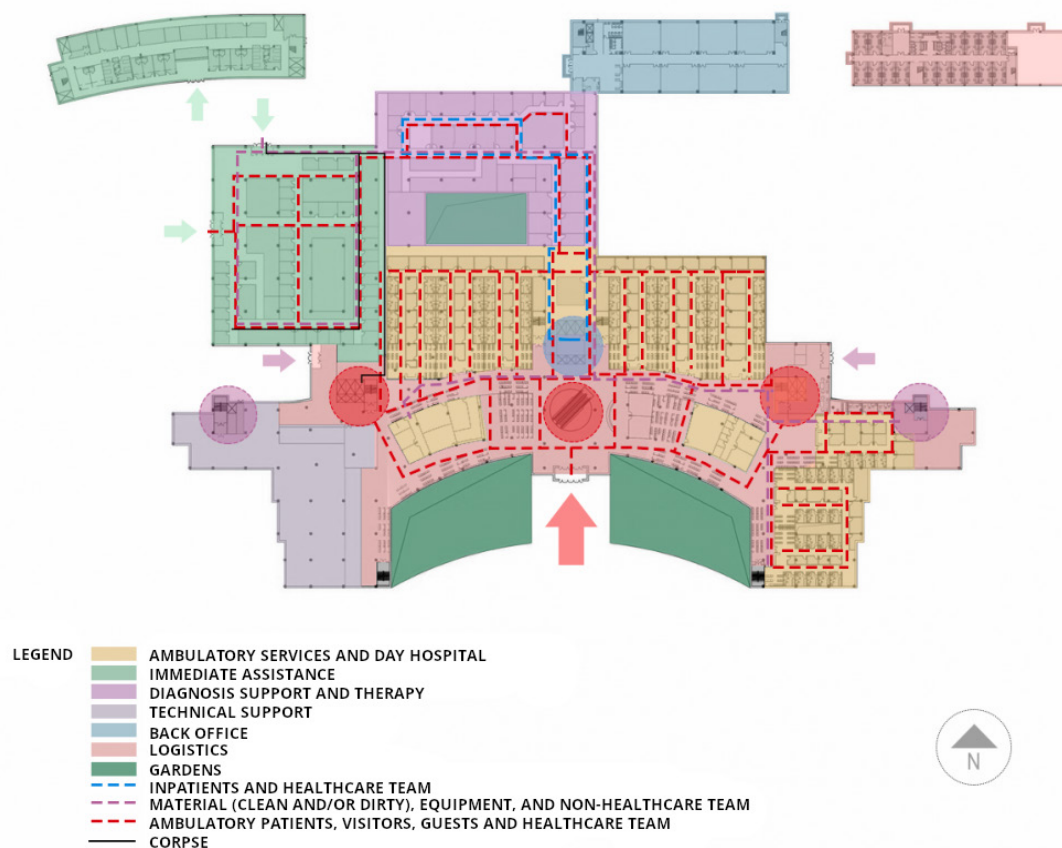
Ground Floor at Suzhou Children's Hospital
